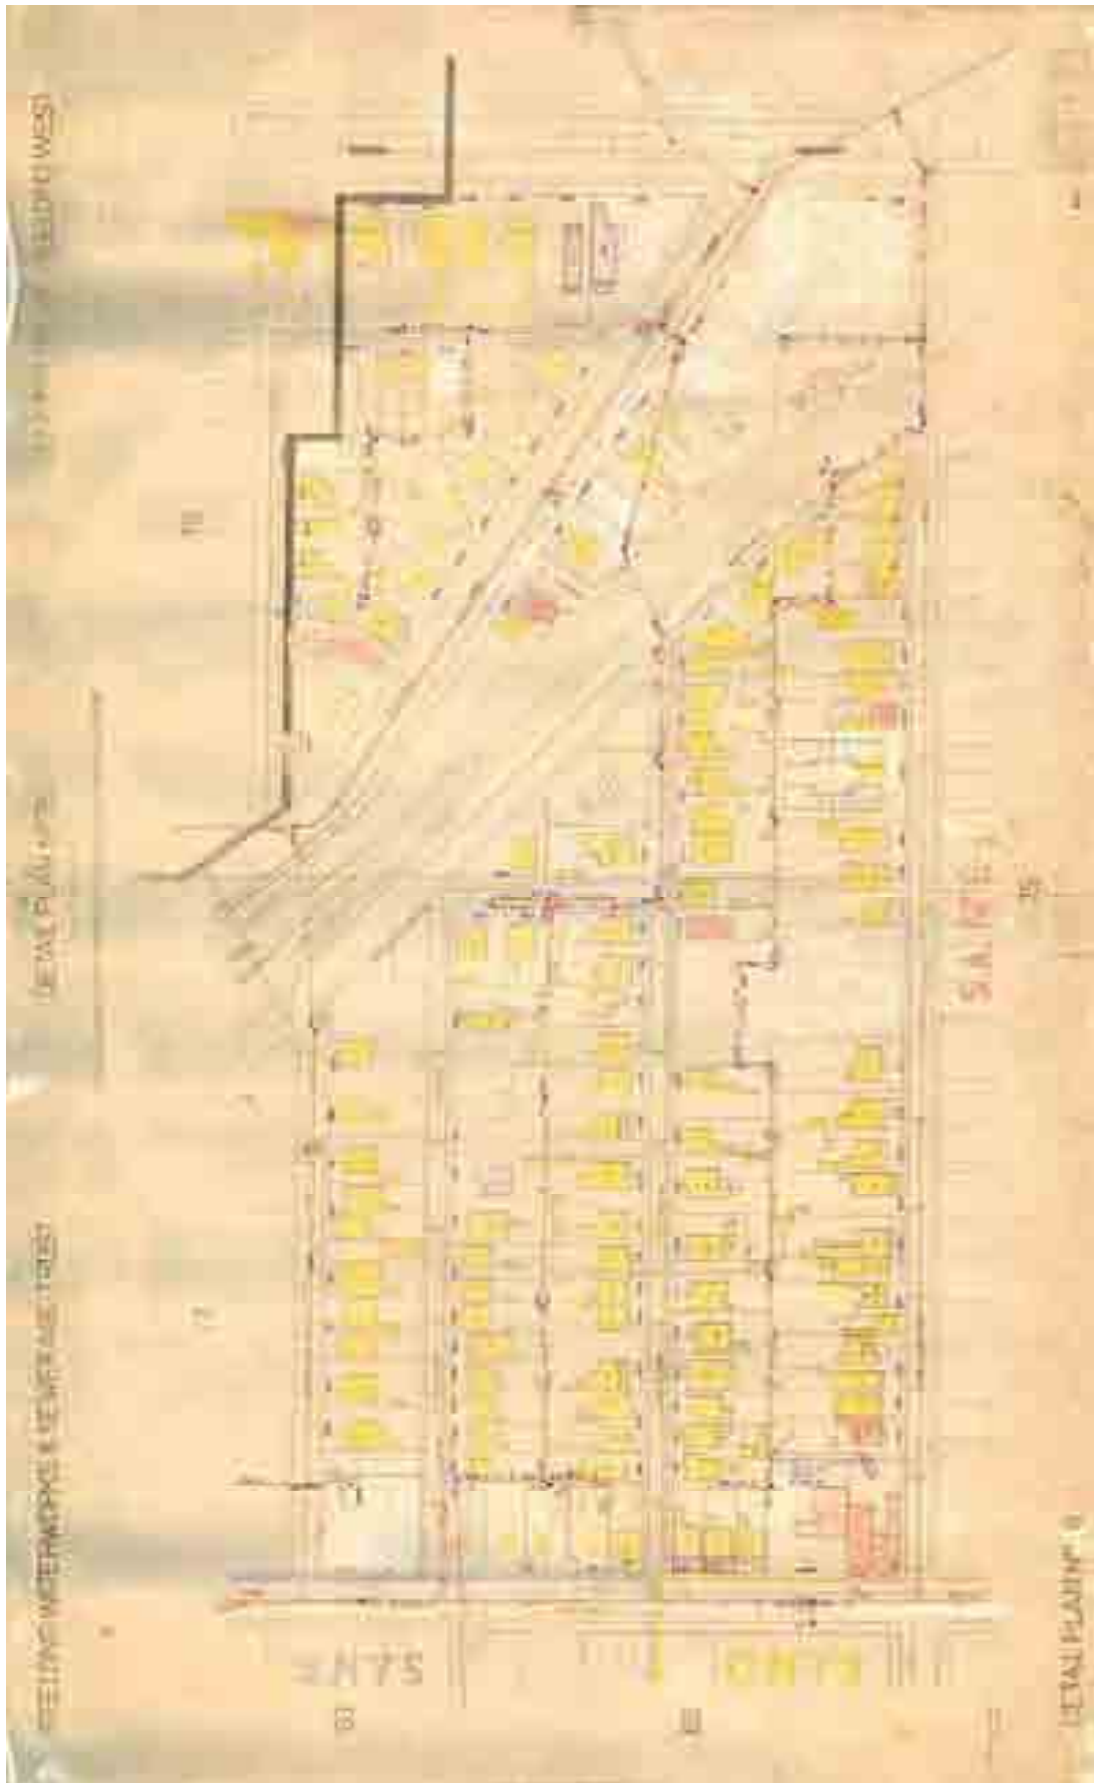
Geelong Waterworks & Sewerage Trust Detail Plan No. 76, 1958. Source: Barwon Water collection.
